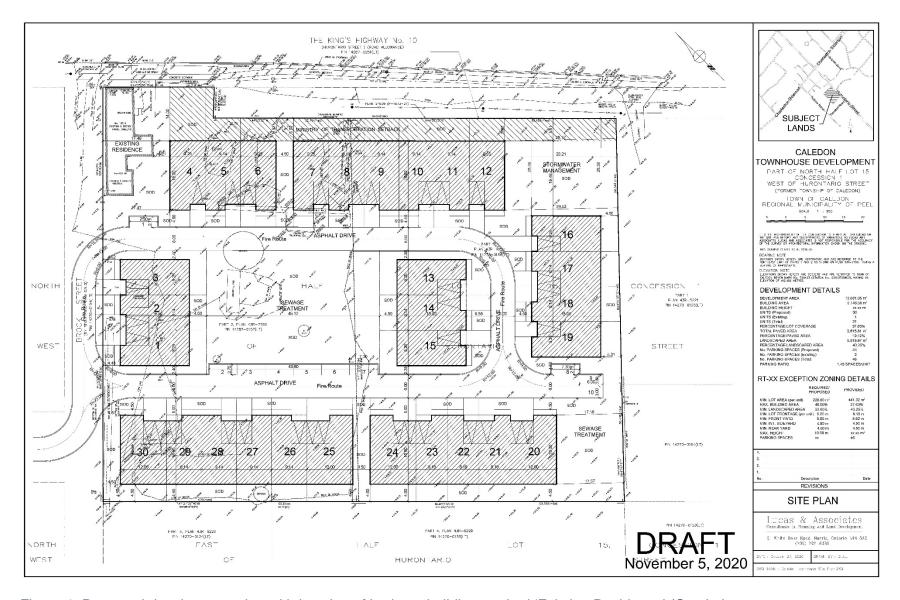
Proposed development plan with location of heritage building marked 'Existing Residence' (Crozier).
